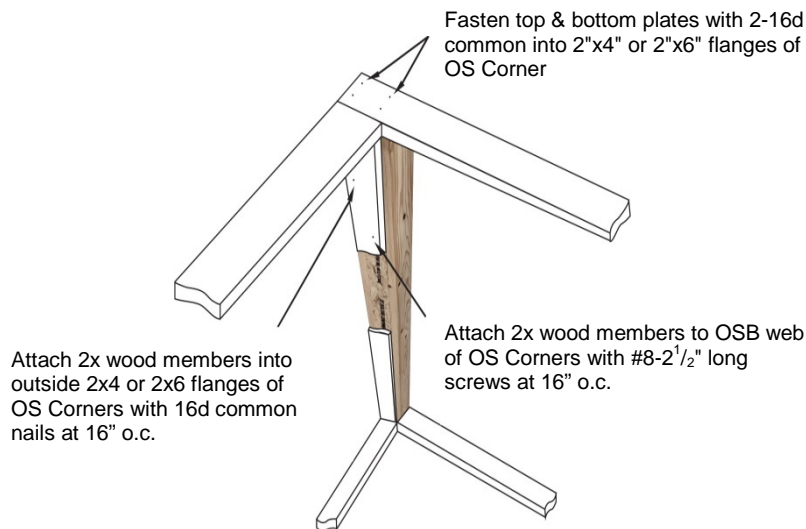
DT OS CORNERS AND TYPICAL INSTALLATION
